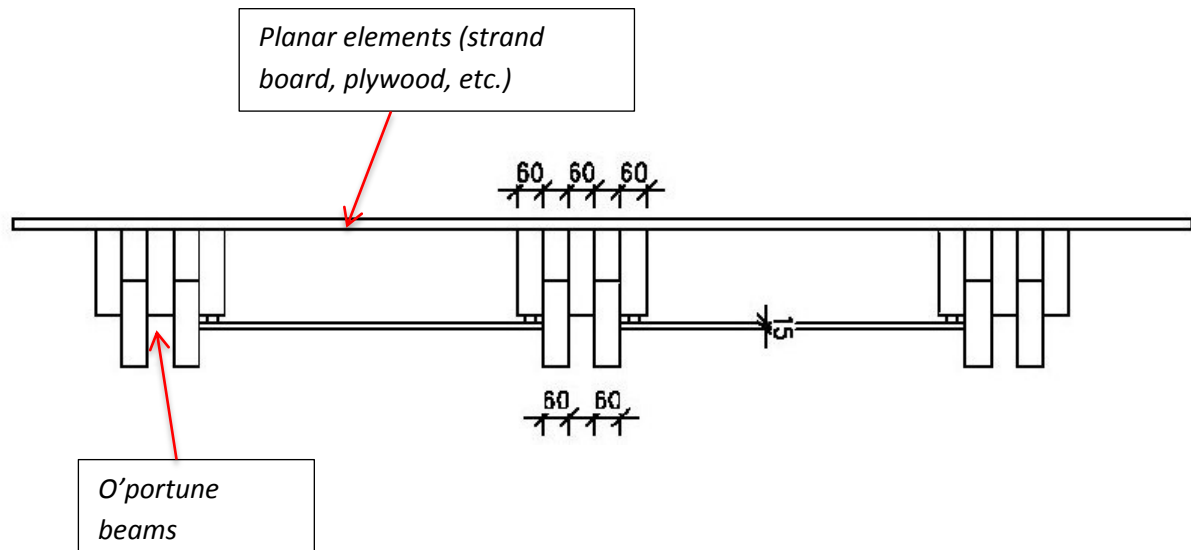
Partial O'portune slab used as beams for 6-8 m spans (Sandoz & des Jordils, 2004).
